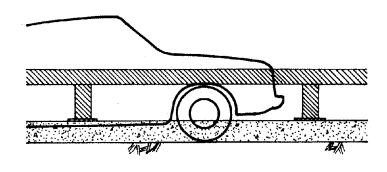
Cross Section of Modified Indiana Type 5A Railing.
